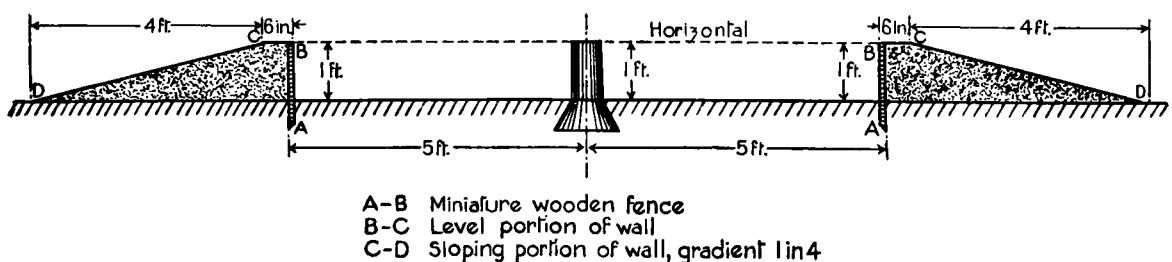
TURF WALL FOR USE AT EXPOSED RAIN-GAUGE SITES
